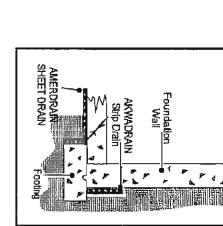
The AMERDRAIN sheet drain can be extended around the base of the footer. Install the AKWADRAIN at the base of the footer following the same steps as detailed above.
